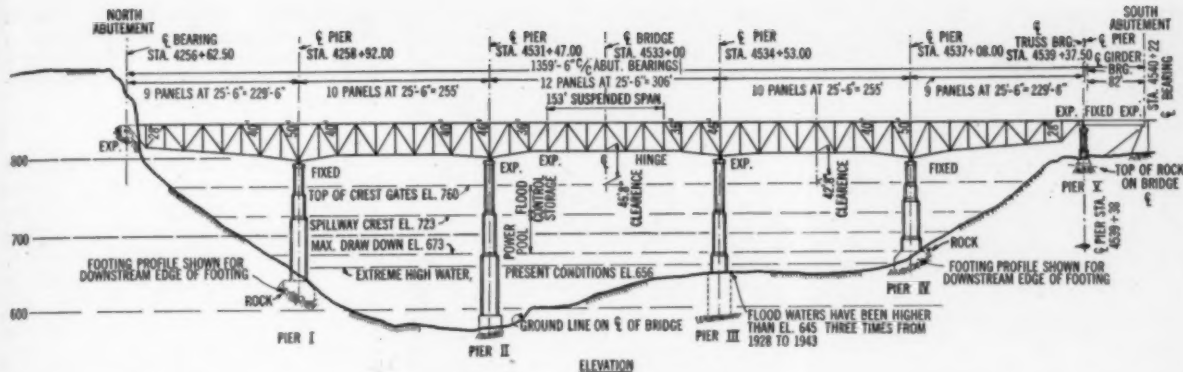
NEW Cumberland River Bridge, designed for Cooper's E-72 loading, rises about 270 ft above stream bed. Tallest pier is 217 ft from rock foundation to top of coping. All piers are founded on rock.
